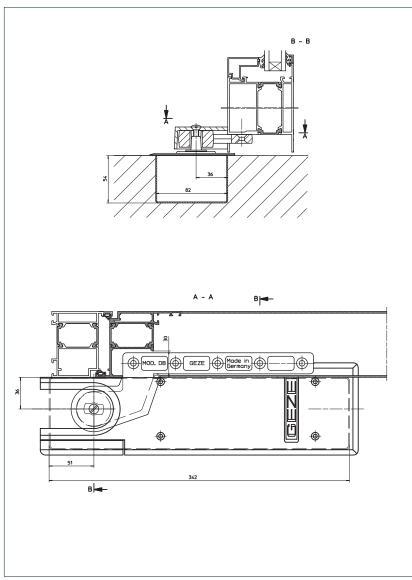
· Standard installation of GEZE TS 550 NV to a single action door
